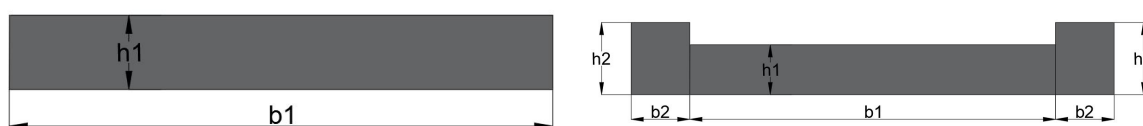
The two deck cross-sections of the bridges to be RE. Left: a rectangular deck cross-section with height 'h1' and width 'b1'. Right: a non-rectangular deck cross-section with height 'h1' and width 'b1' of the mid strip and height 'h2' and width 'b2' of the edge beams.
